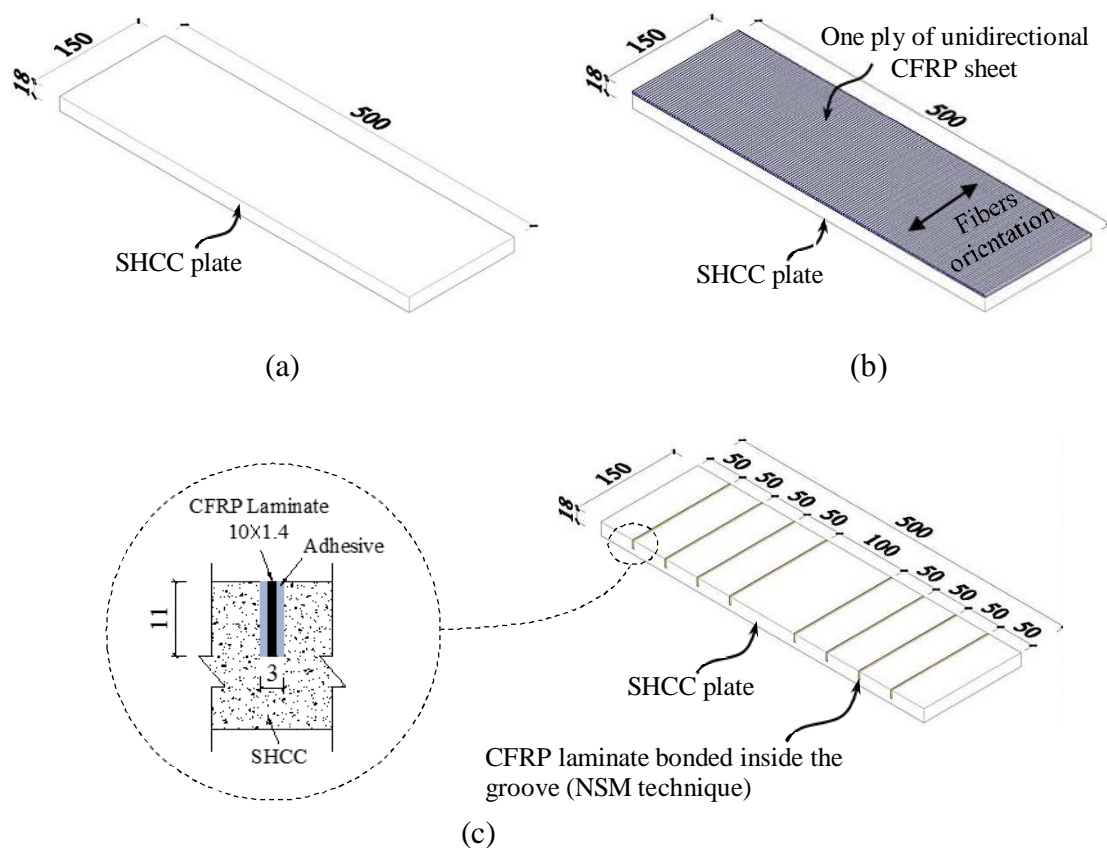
Details of the strengthening plates: (a) SHCC plate, (b) HCP^(S), and (c) HCP^(L) (dimensions in mm)
